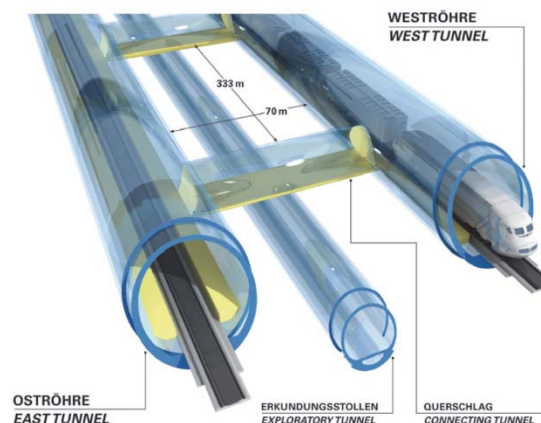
Brenner Base Tunnel System with two Main Tunnels and the Exploratory Tunnel (Eckbauer et al., 2014).
